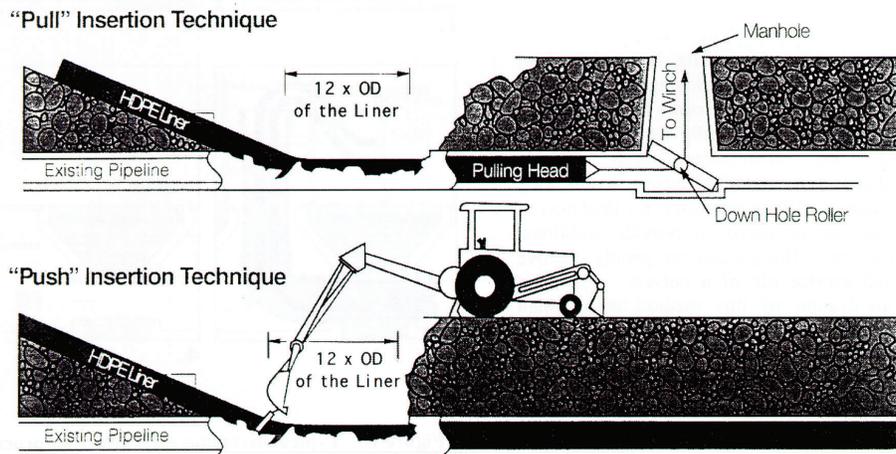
Drawing. Insertion Method for Butt Fusion Welded HDPE Liner.⁽³⁷⁾
